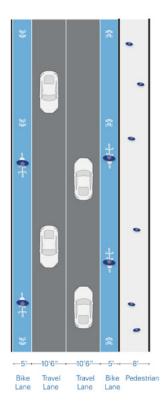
Market St. Bridge existing condition and potential streetscape improvements
